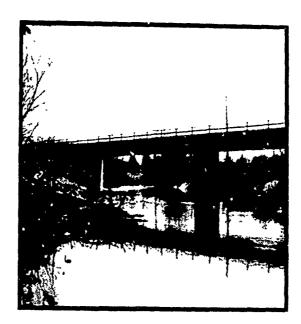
Downstream face of Royalton Road bridge, stream mile 21.9.
